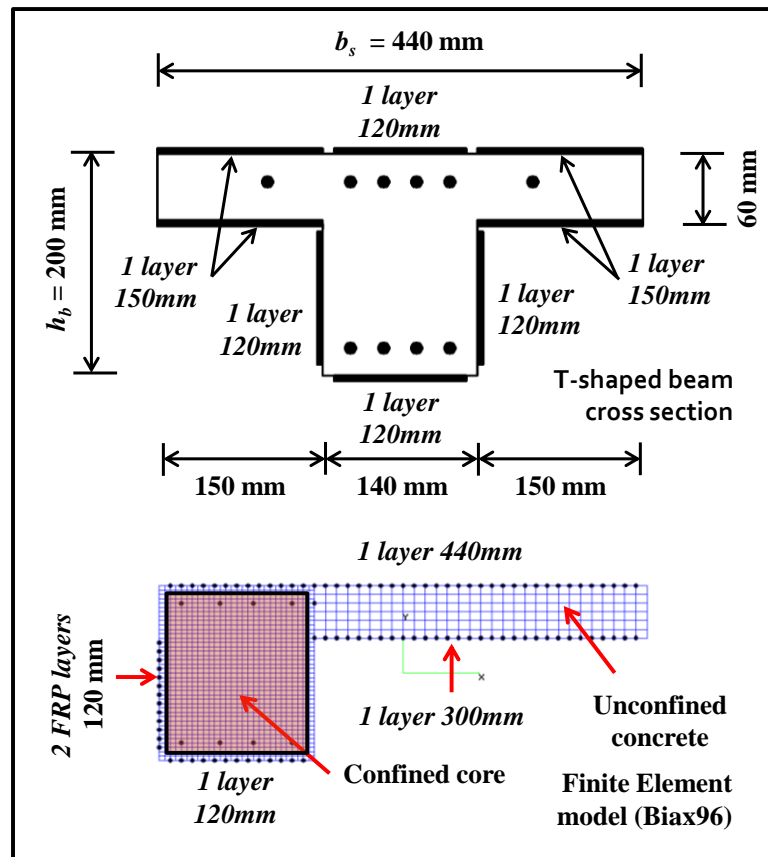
Retrofitted T-shaped beam cross section and modelling.
